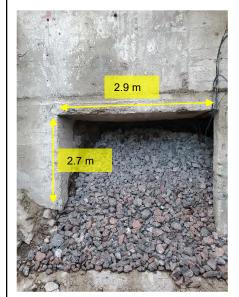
Close-up of Raise 1 that was backfilled with -5 to -8 inch material.
